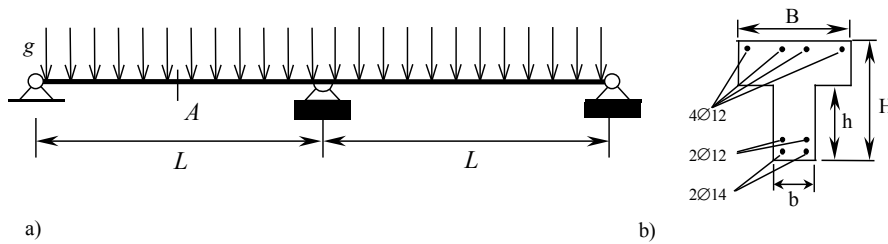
Reinforced continuous beam: a) structural model and load condition; b) geometry of the cross-section and location of the reinforcement.
